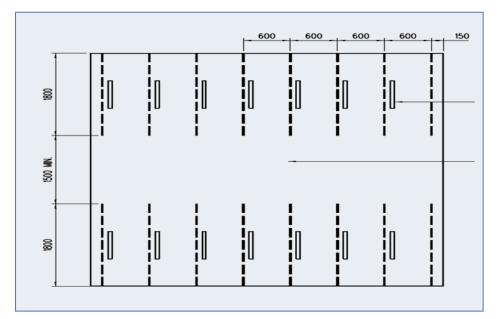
Plan View of Parking Space With Single-Tier Bicycle Parking
